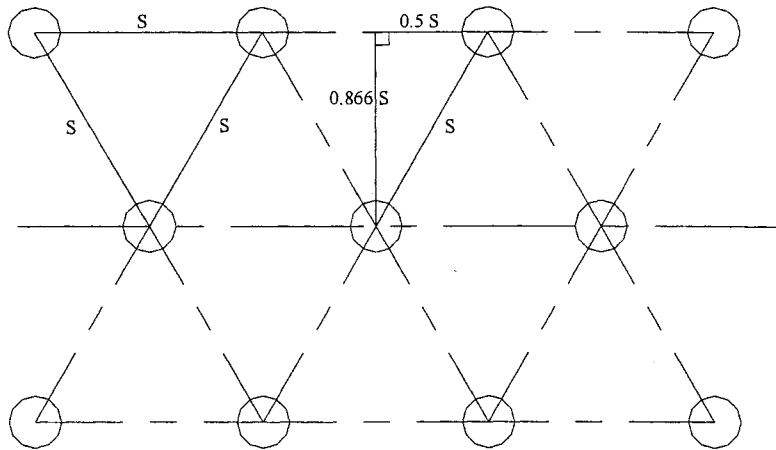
Equilateral Spacing of SDGM Reinforcement
